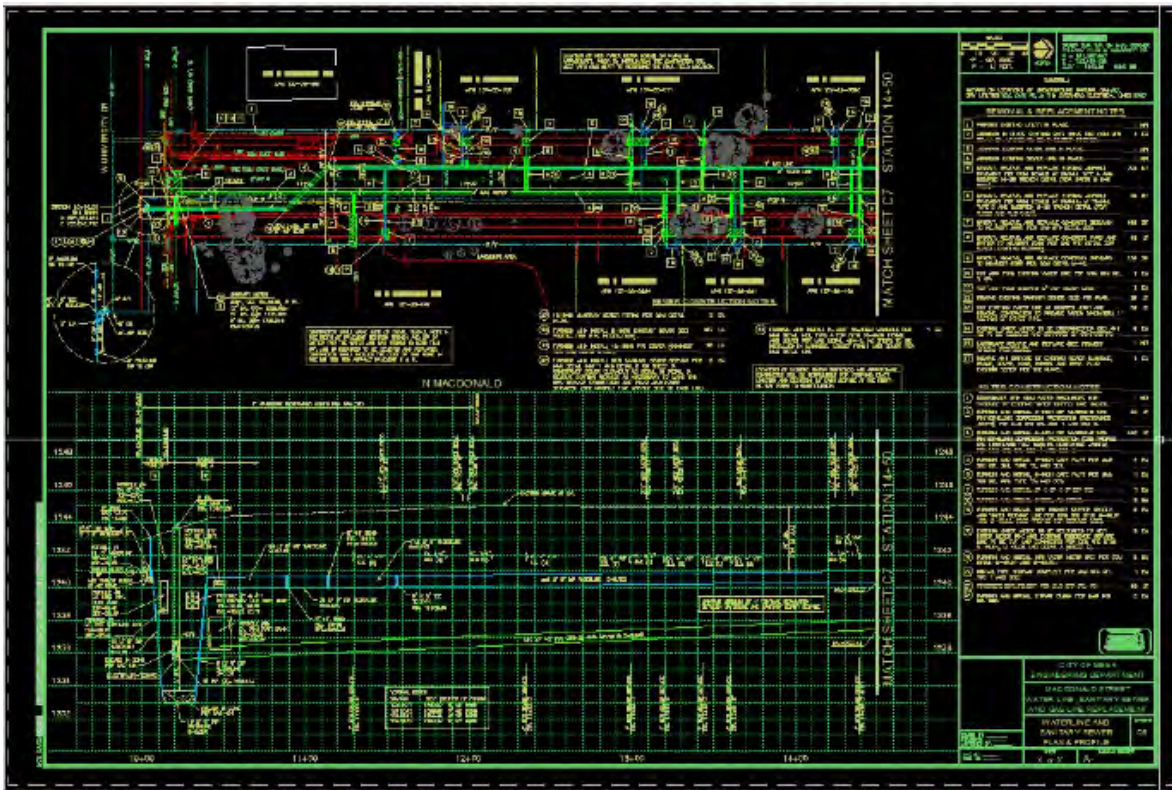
Typical Example of a Plan and Profile Sheet
